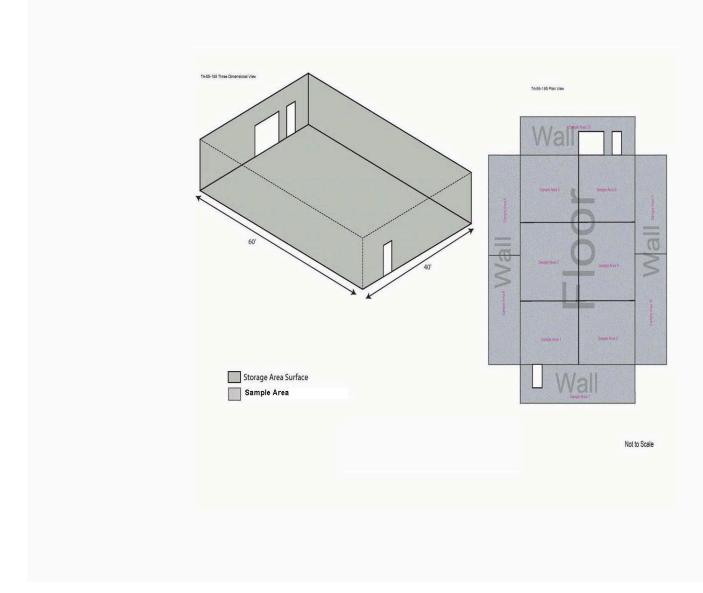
Technical Area 55, Building 185, Indoor Container Storage Unit Grid Sampling Locations
